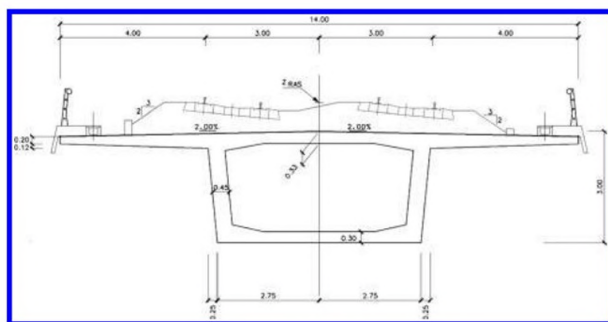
Mid-span cross-section. Concrete solution (50 meters span).
